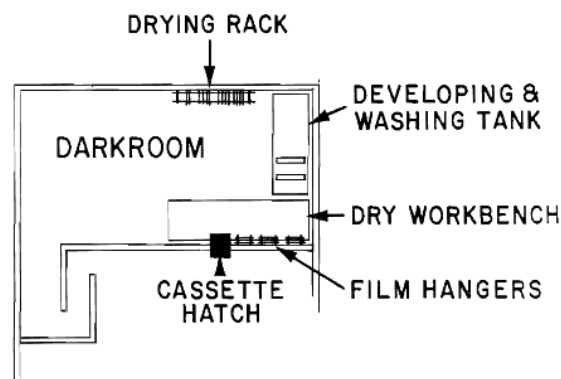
Suggested layout of a darkroom (Note: cassette hatch is optional)
